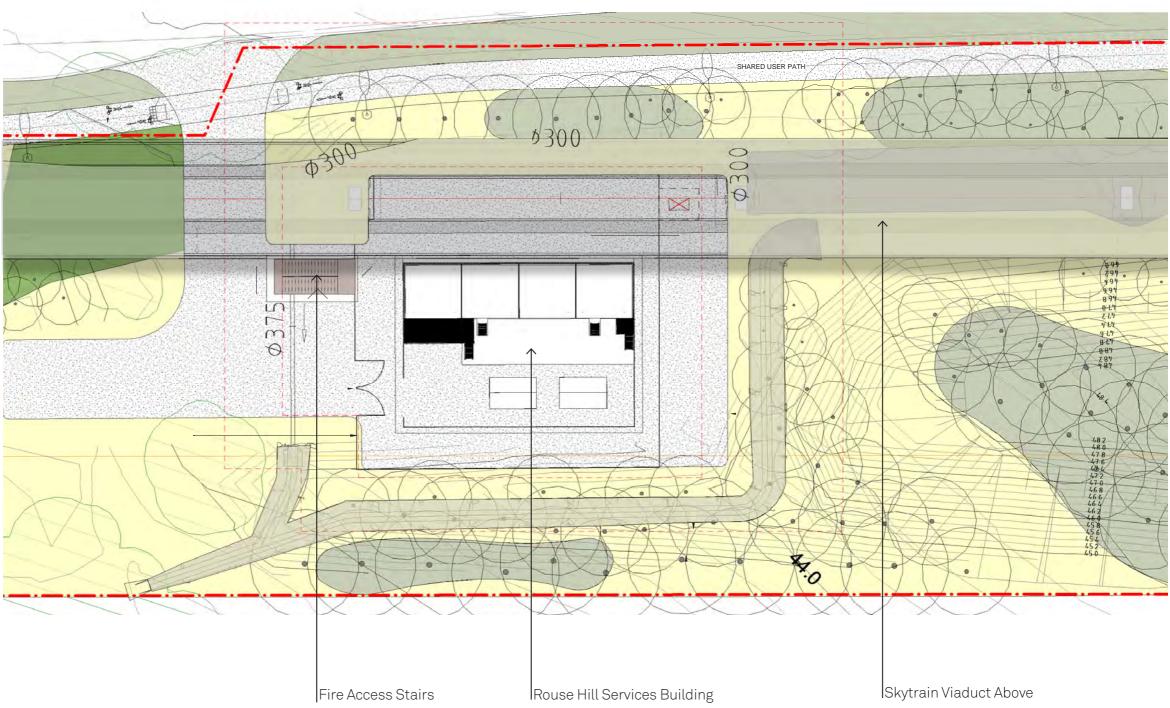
COR_Rouse Hill Service Building Plan. Source: HASSELL.
